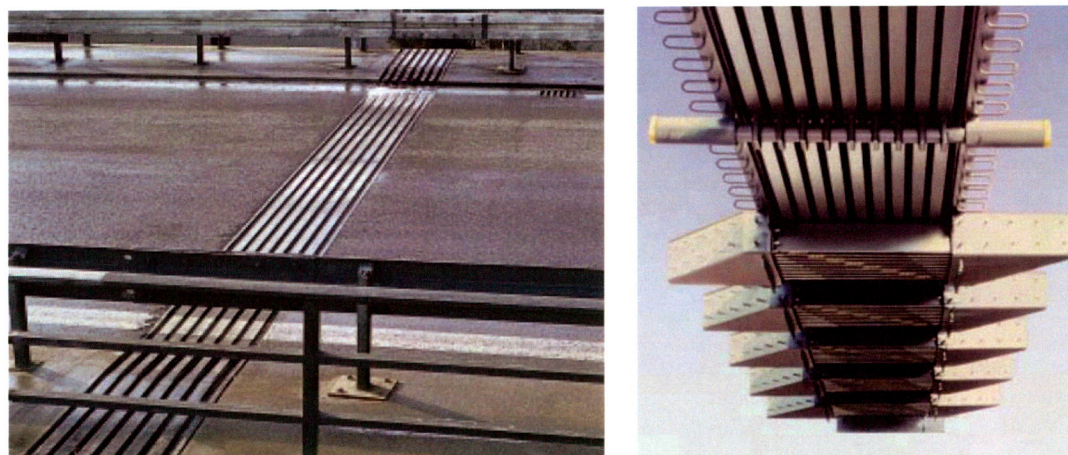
Left: An installed girder grid joint; Right: Bottom view of the multiple support bars.
